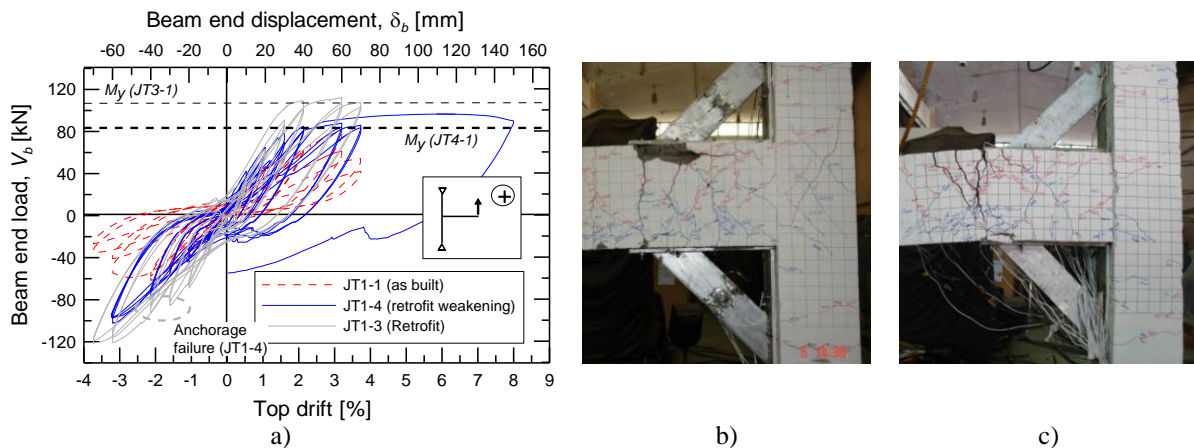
a) Comparison between as-built specimen and two different retrofit schemas (Genesio and Sharma, 2010); b) Cracking pattern of specimen JT1-4; c) Cracking pattern of specimen JT1-3
